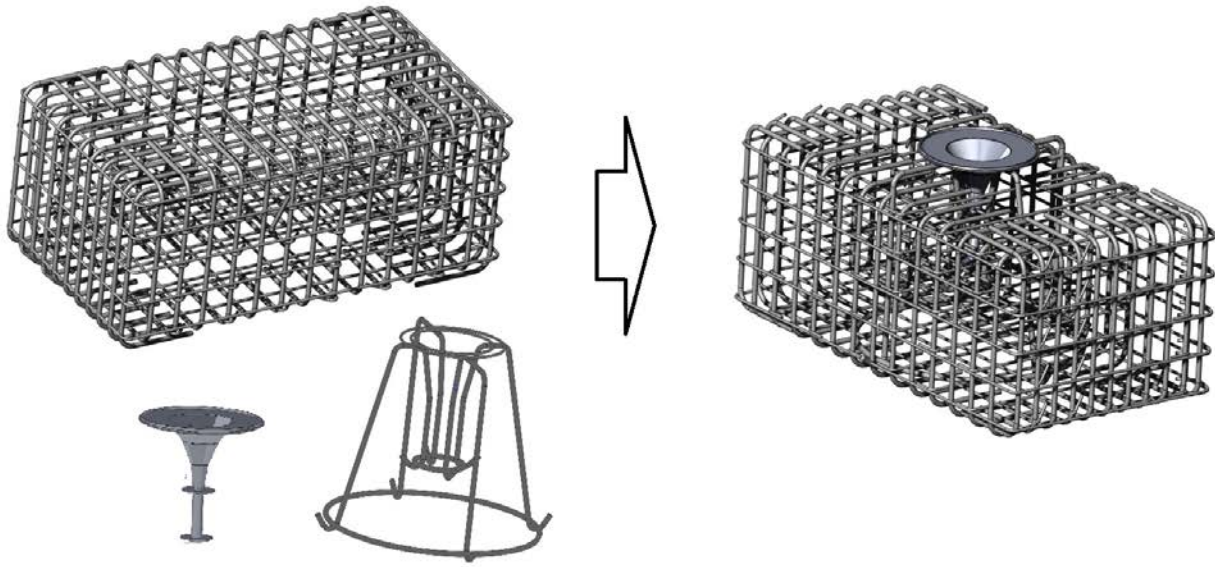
Left: VGT, the rebar network for the tube locally and the concrete block, designed to reinforce pier to resist earthquake-induced forces [35]. Right: the finished rebar-layout with a V-tube.
